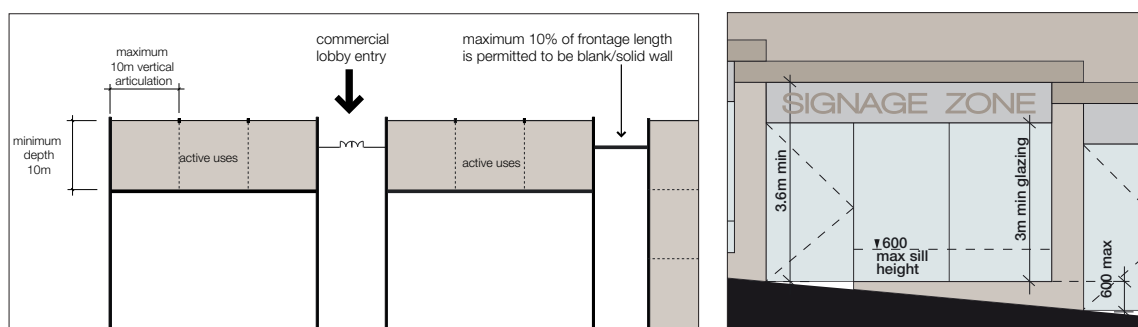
Active Frontages Plan Diagram and Active Frontages Elevation Diagram
